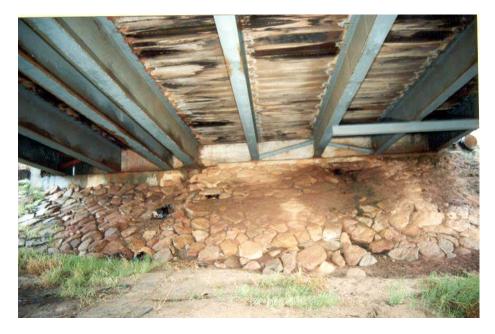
B(2) - TIMBER DECKING ON STEEL BEAMS – VIEW FROM UNDERSIDE OF BRIDGE
